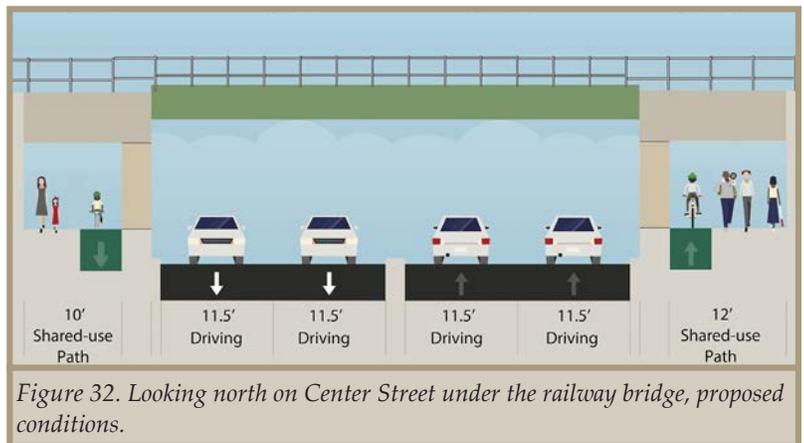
Looking north on Center Street under the railway bridge, proposed conditions.
